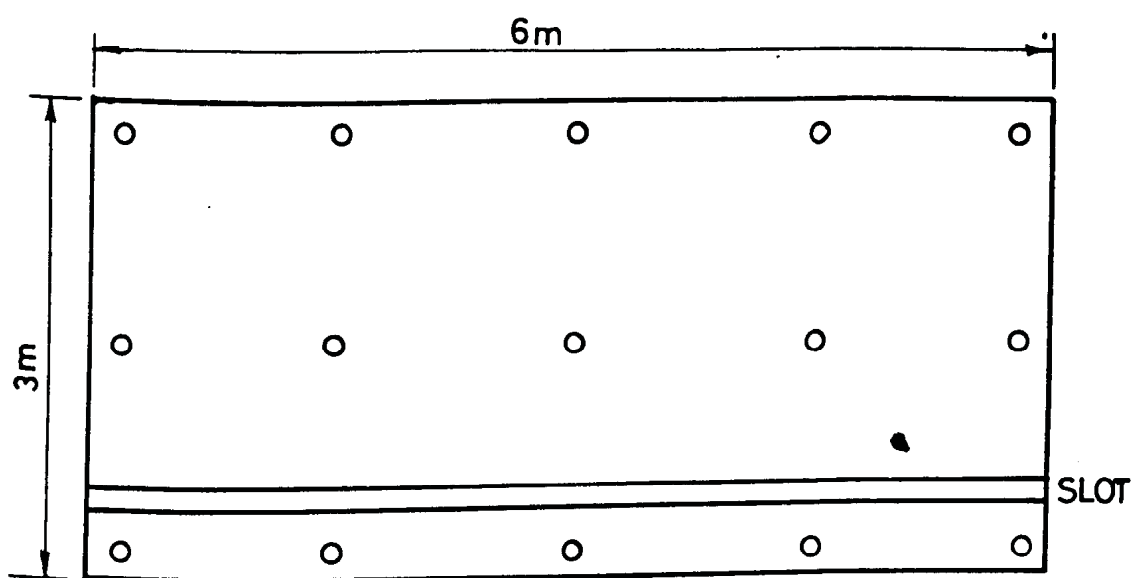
Typical drilling pattern of conventional drill and blast face.
